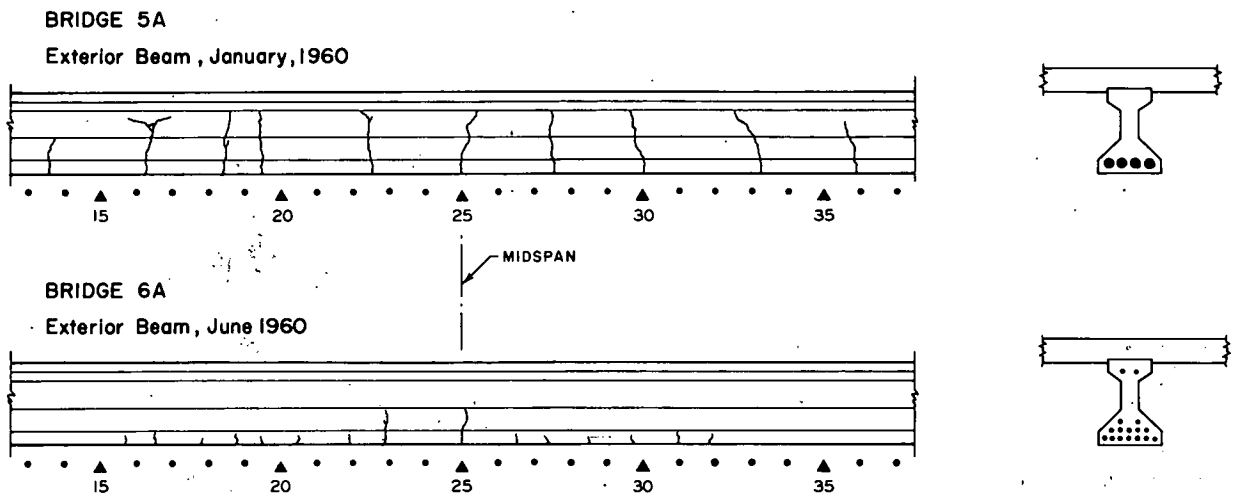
Crack patterns on prestressed concrete beams.
